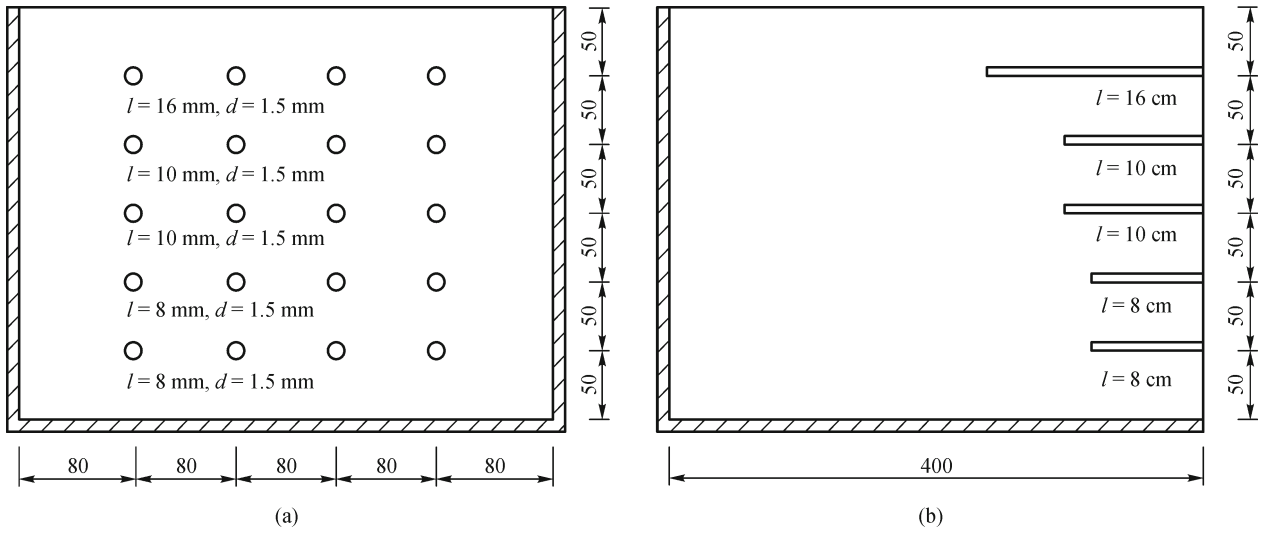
Arrangement of bolt. (a) Elevation view of bolt arrangement; (b) profile of bolt arrangement (case 2, unit: mm)
